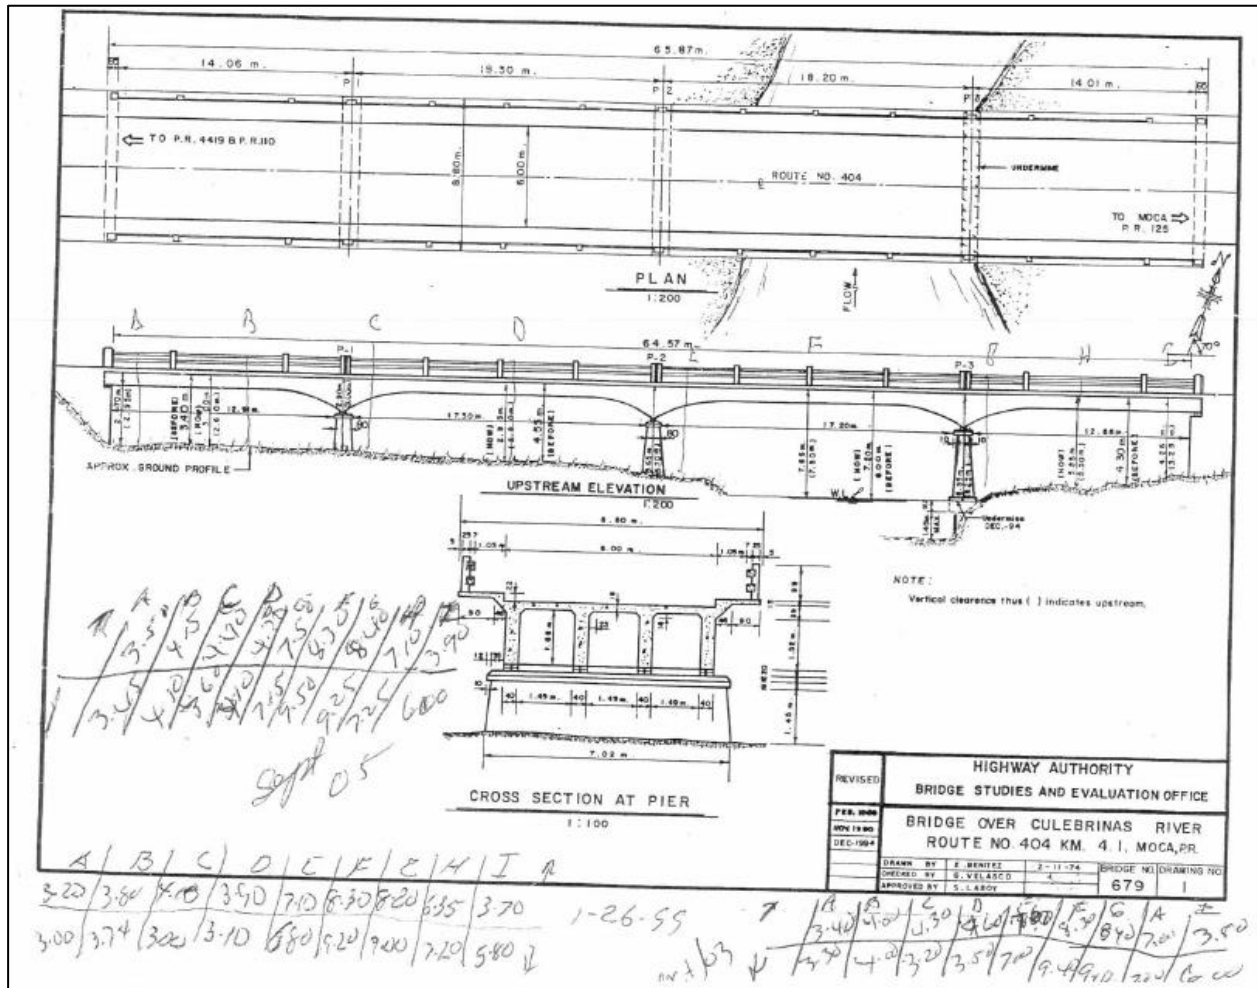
Bridge 679 drawings (source: PRHTA)
